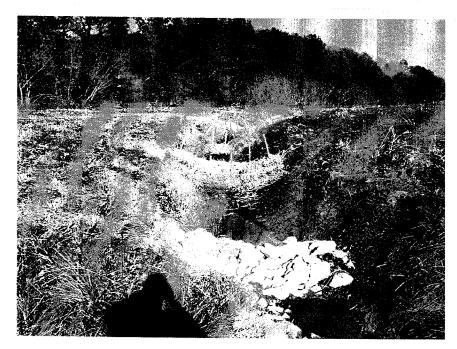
Sediment check dams and hay bales paced in drainage ditch to prevent ash from getting into the river.
